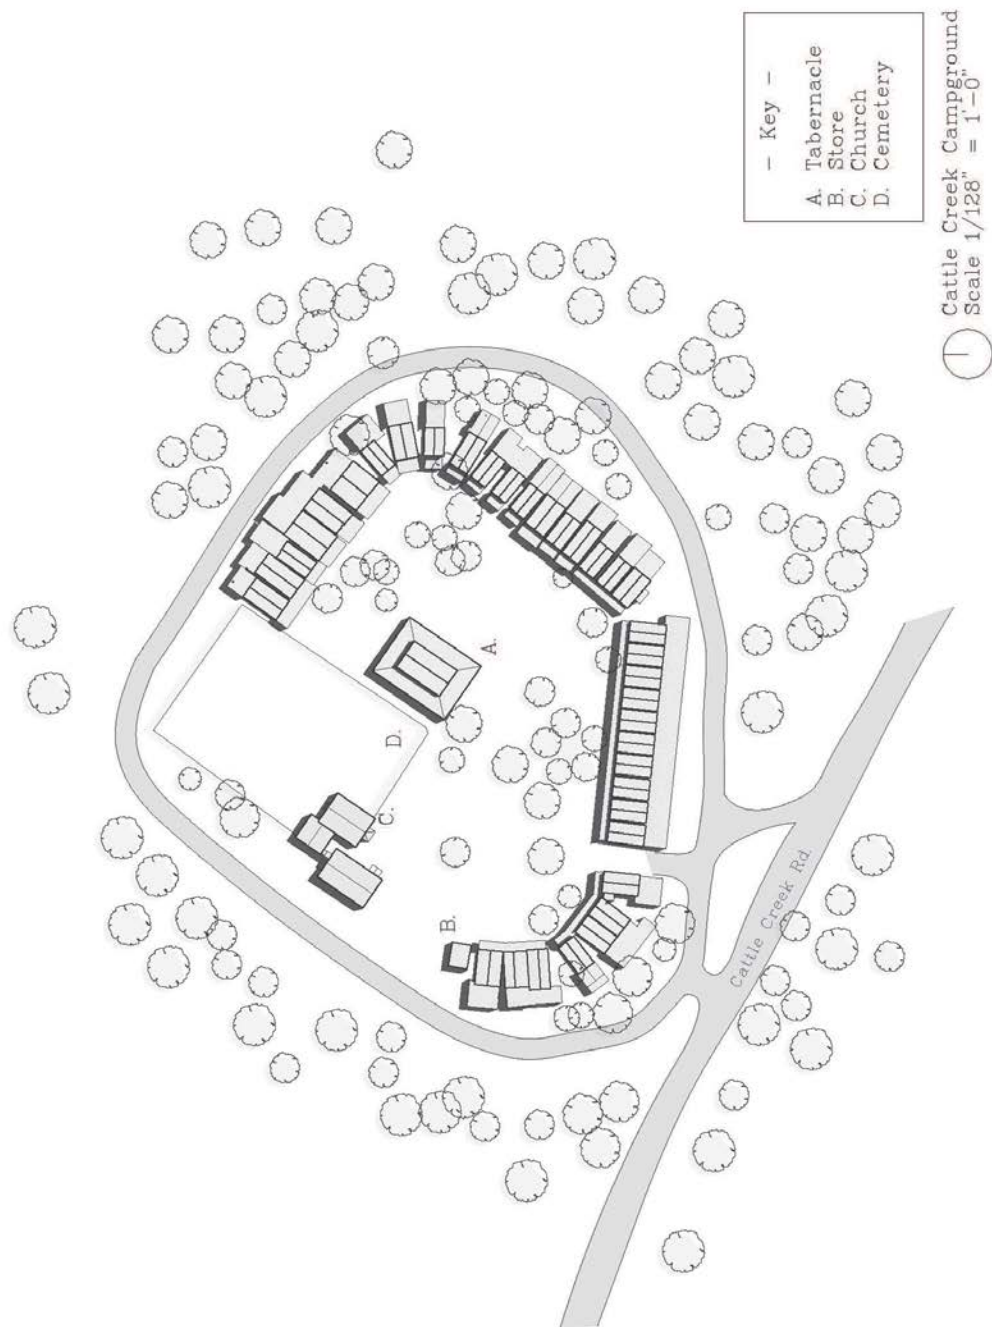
Site plan of Cattle Creek Campground. Illustration by author.
